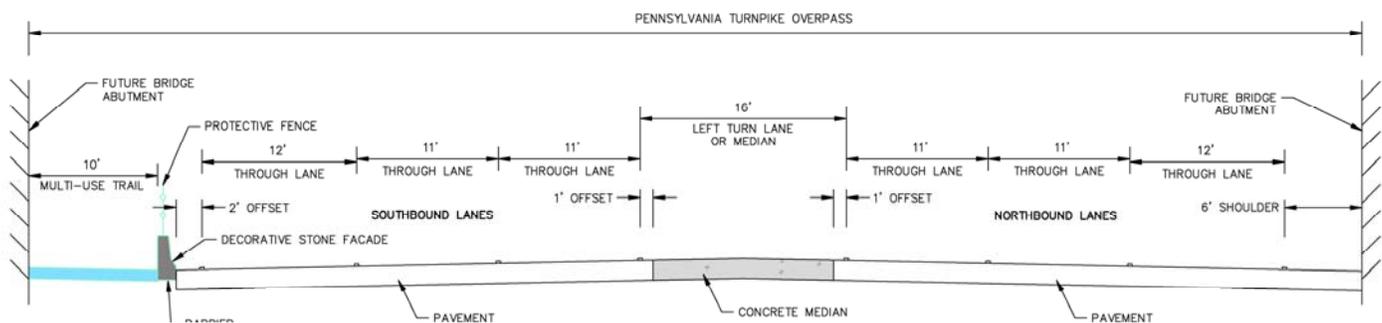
Long Term Typical Section for Pottstown Pike under the PA Turnpike Bridge
